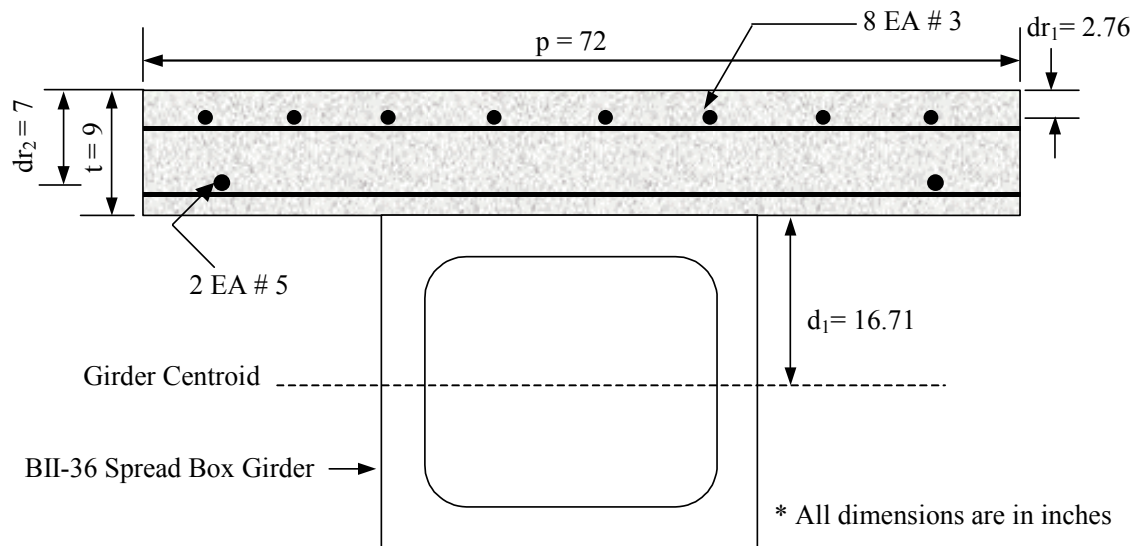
Geometry and reinforcement arrangement of the deck section supported on PC spread box girders
